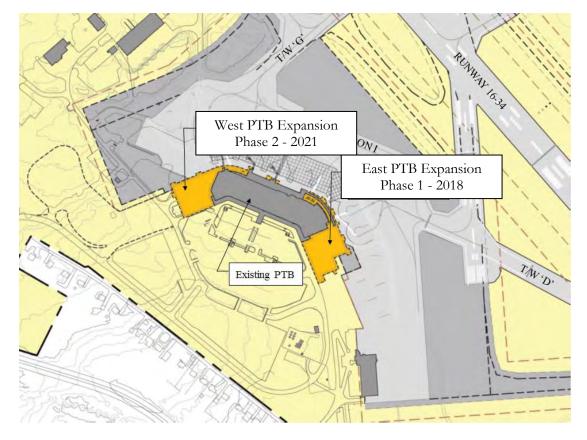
ATB East and West Exapnsion Phasing Plan
